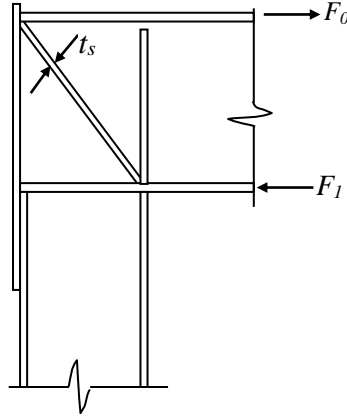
Forces and Stresses Assumed to act on Unstiffened Straight Corner Connection
